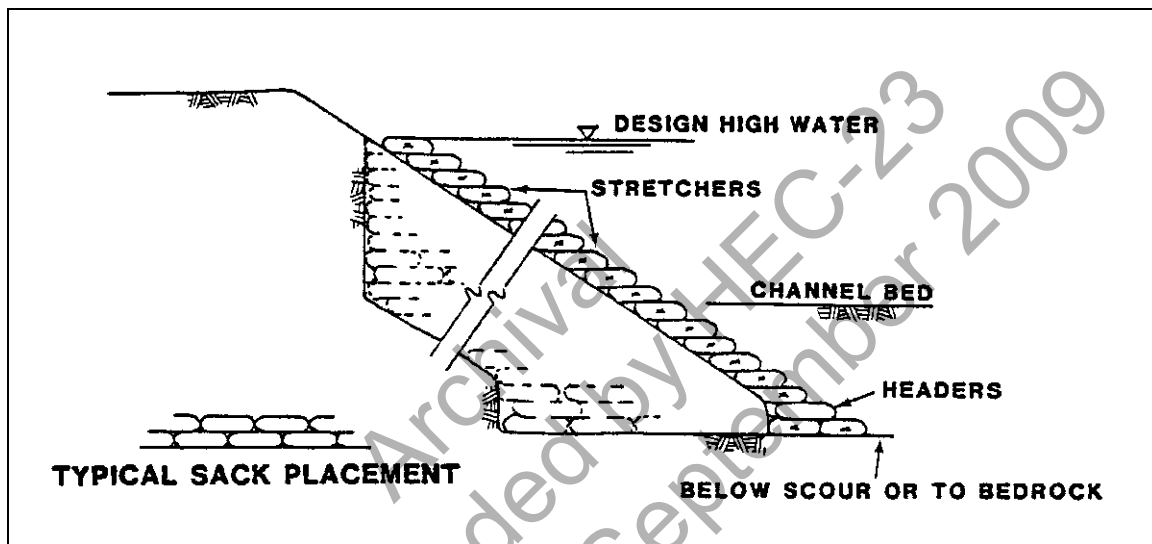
Typical sand-cement bag revetment (Modified from California Department of Public Works, 1970 (after Brown)).⁽¹¹⁾
